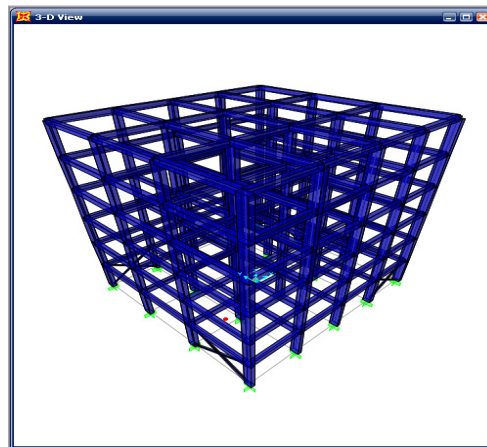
Modelling of Updated Building Case-3 Steel Bracing [06]
